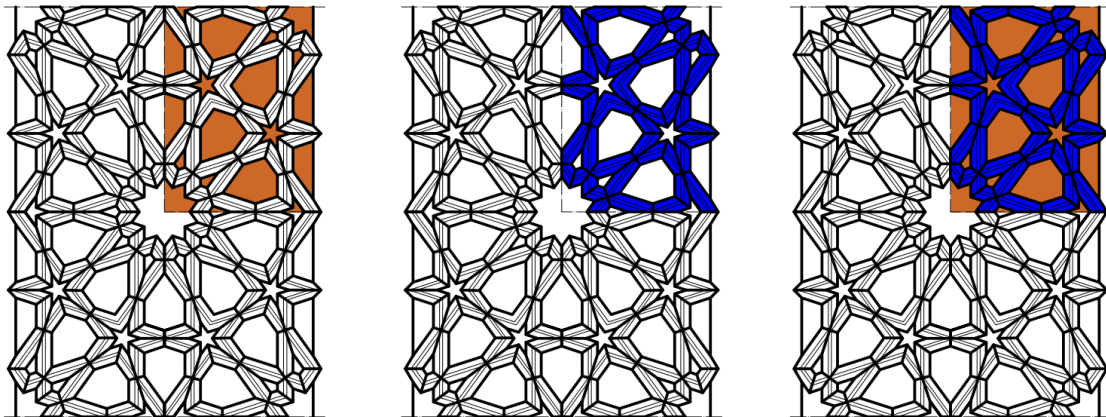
Drawings of the inner filling parts and spine laths of the door wings of Behram Pasha Mosque
